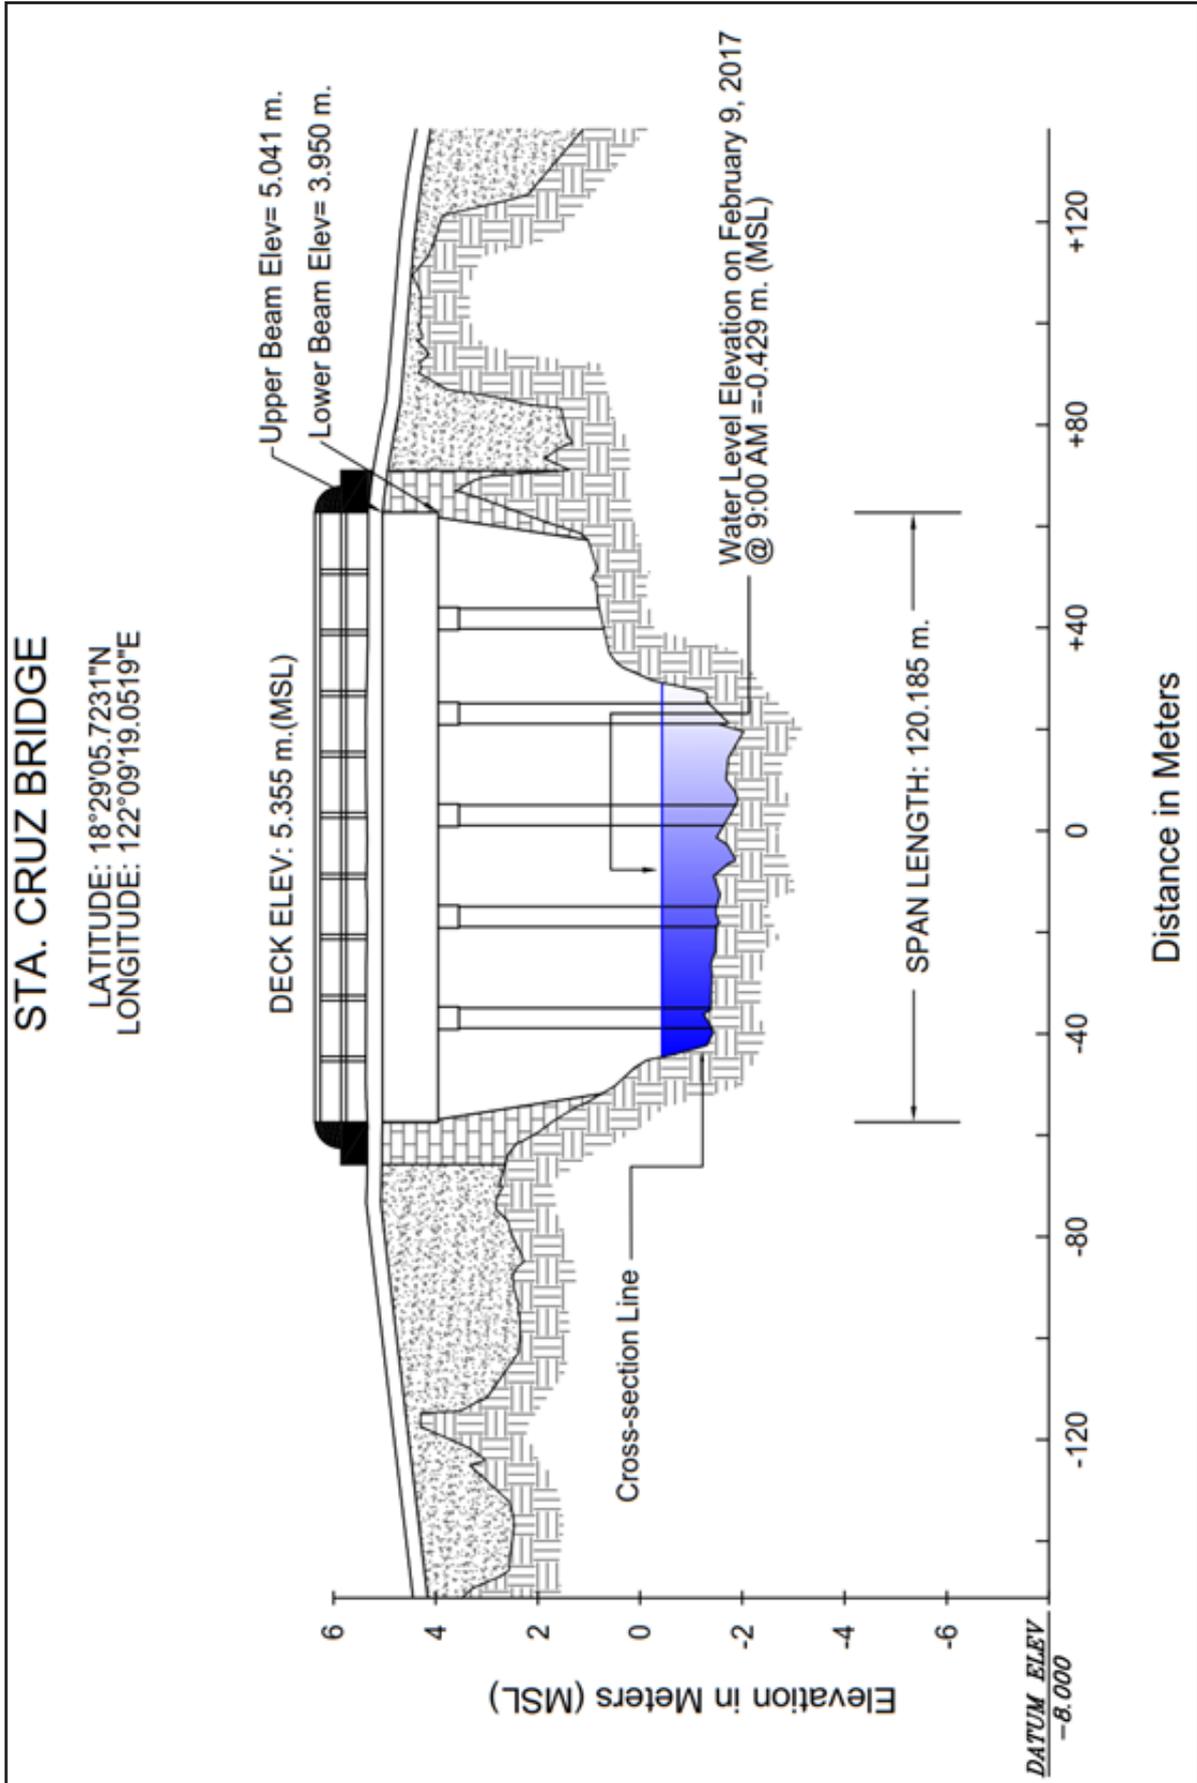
Sta. Cruz Bridge Cross-section Diagram
